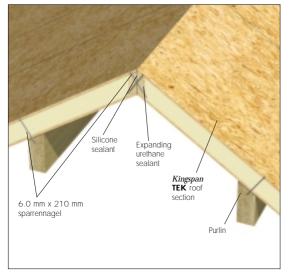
INSTALLATION OF ROOF SECTIONS WITH NO RIDGE BEAM
